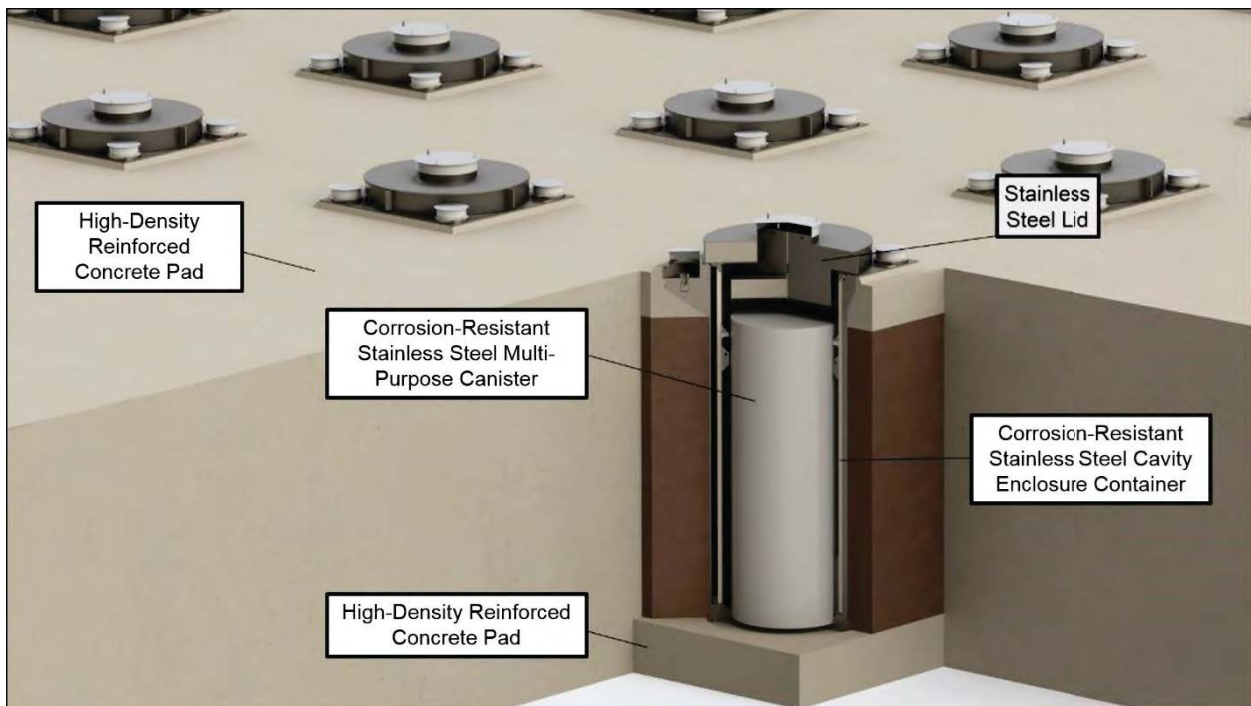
Illustration of a multi-purpose canister in a storage module supported by the concrete pad and surrounded by flowable grouting material.
